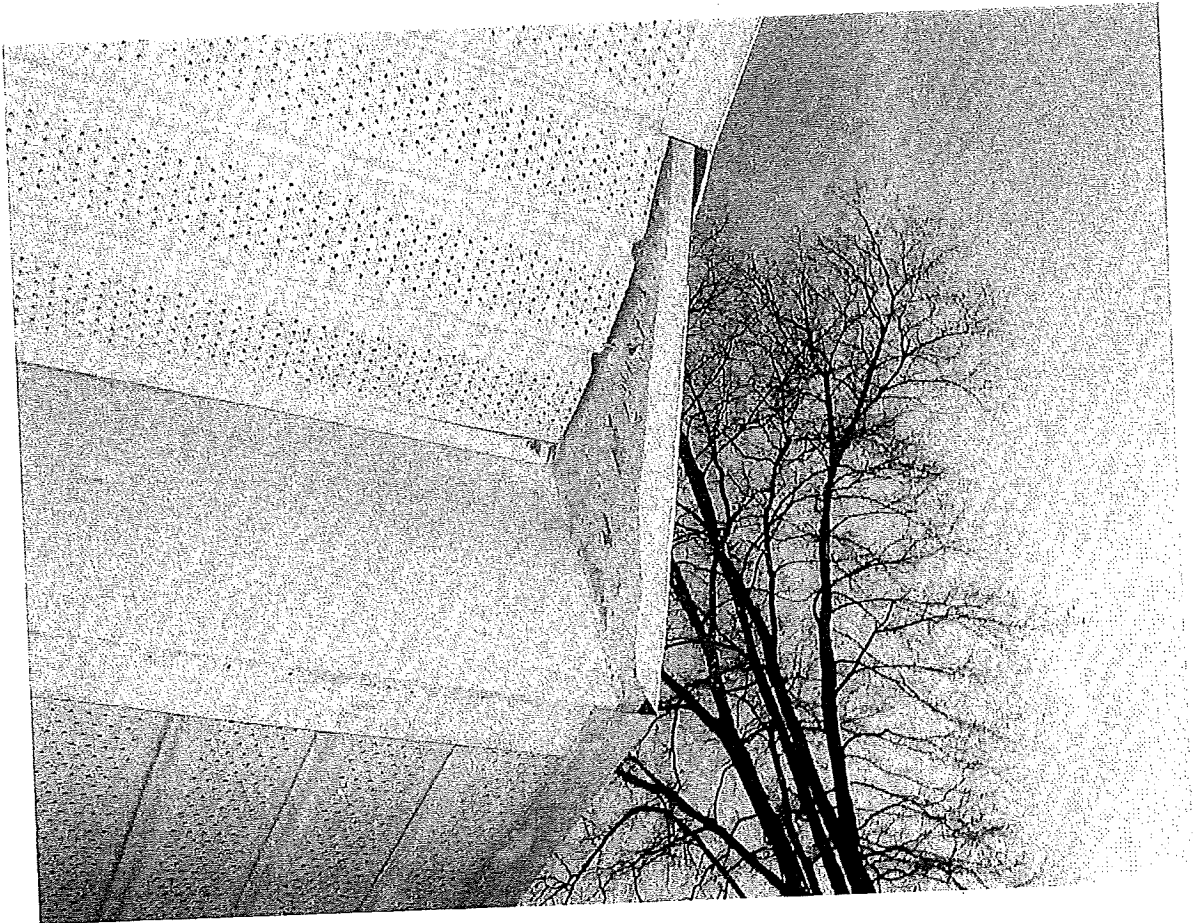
Exposed Tail/Bottom of Wood Fascia Board – Side B (right)
